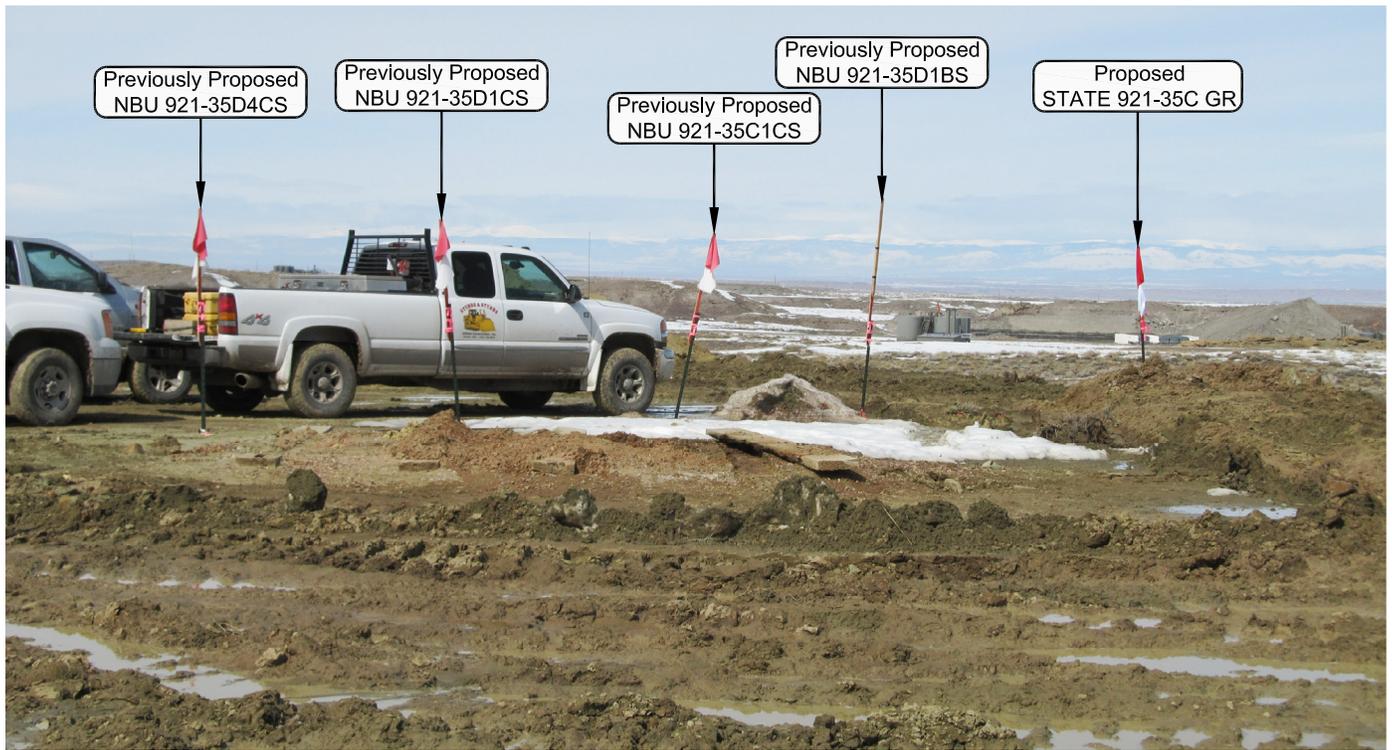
PHOTO VIEW: FROM PIT CORNER D TO LOCATION STAKE
